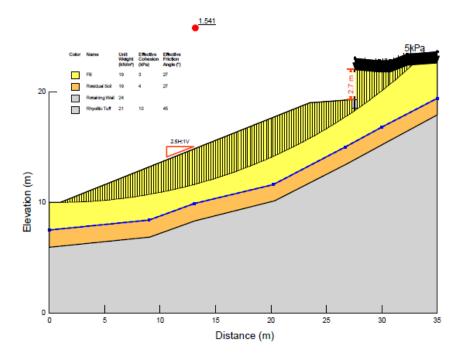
SlopeW Analysis for 2.7m high Retaining Wall (DRG C3602 – CE302 A Section C)
